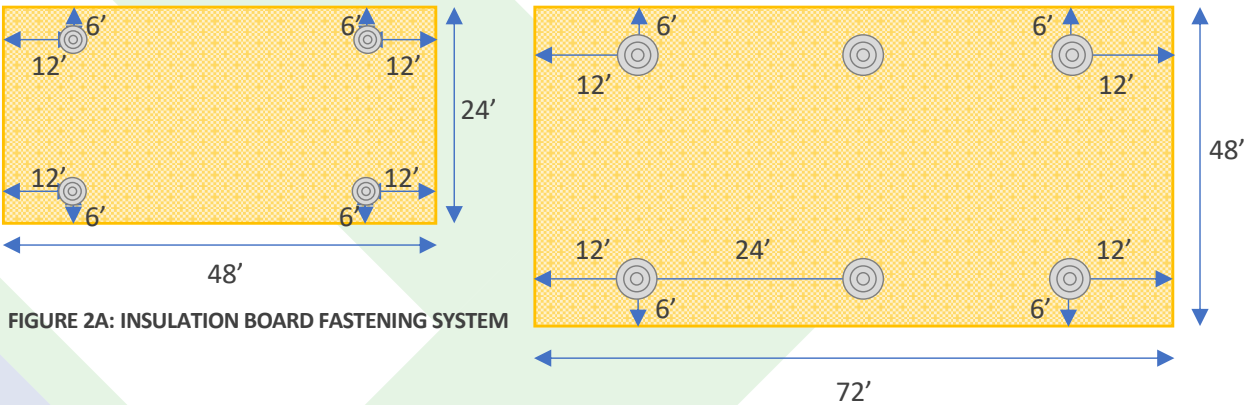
A: INSULATION BOARD FASTENING SYSTEM
